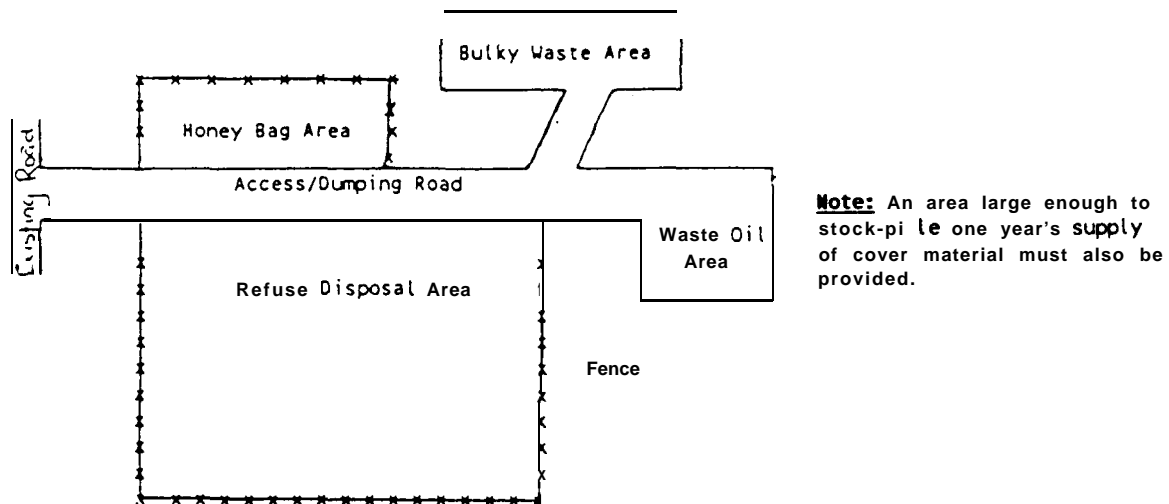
Typical Solid Waste Disposal Facility Layout
